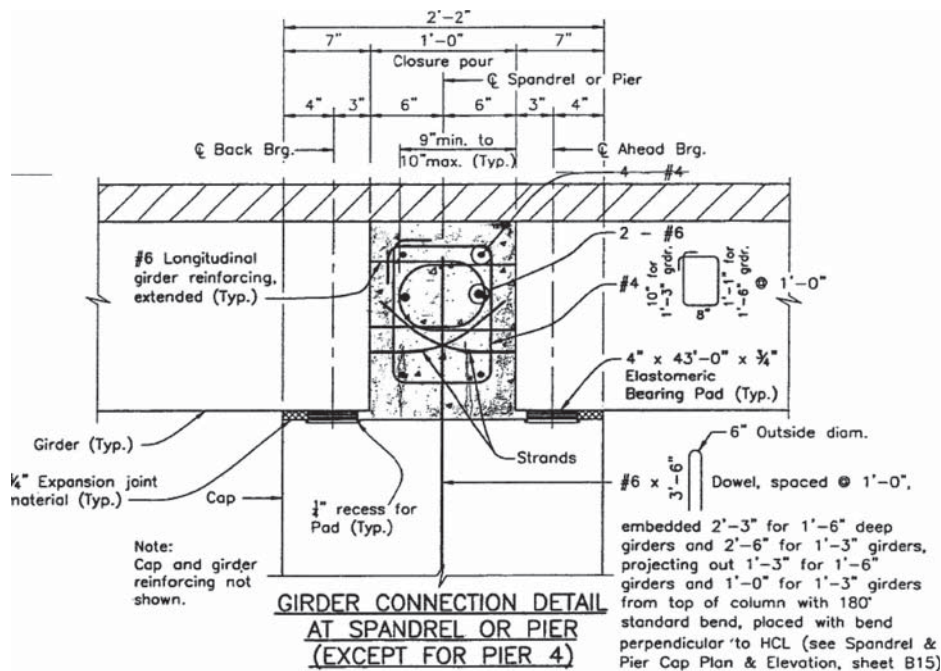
Continuity detail over the cross piers used on Castlewood Canyon bridge, Colorado.
